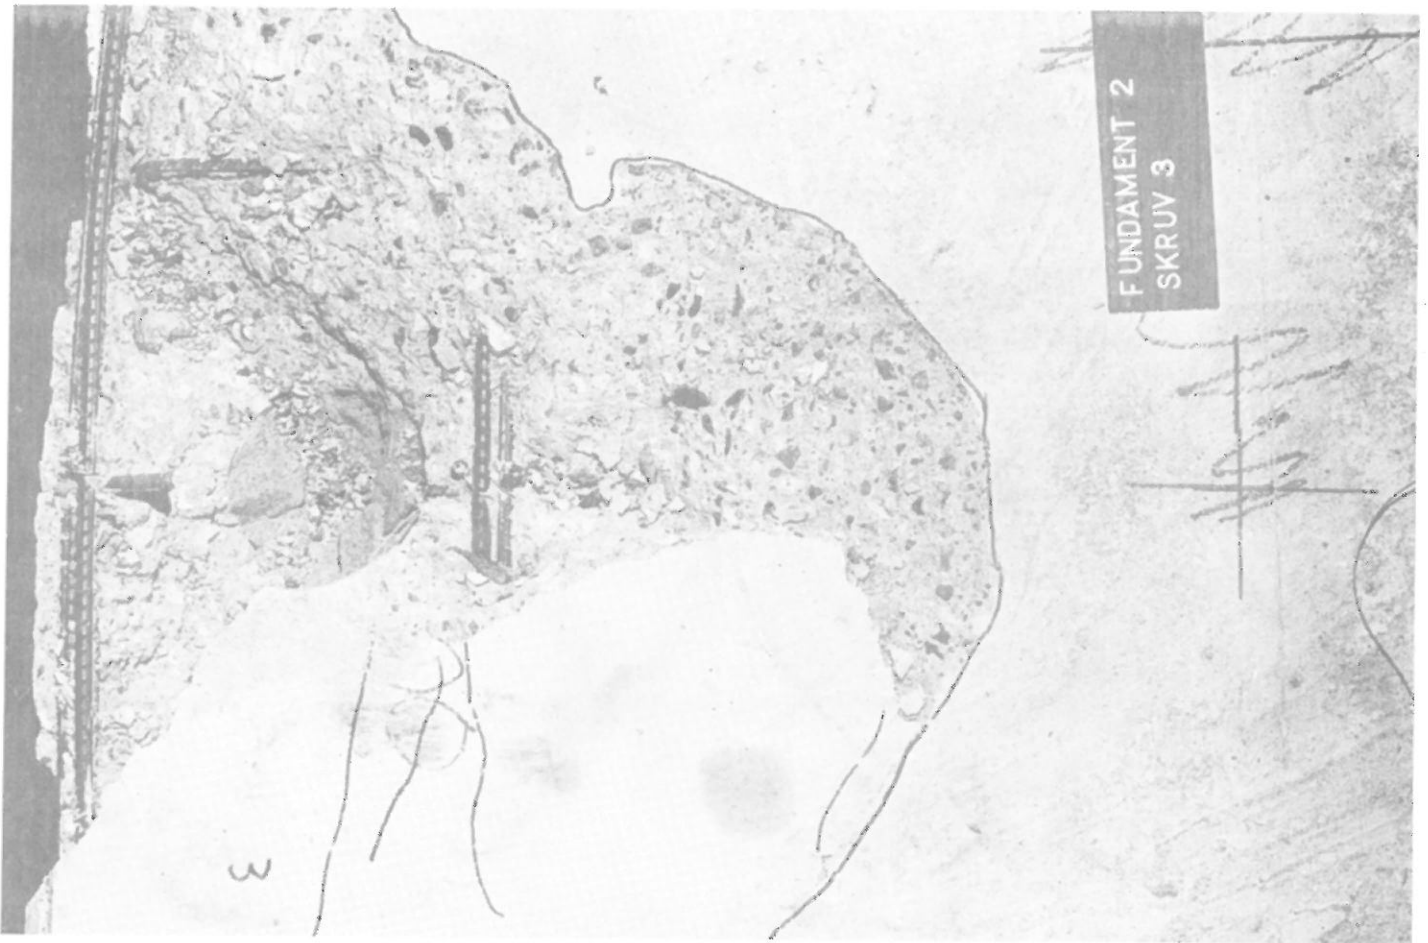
Anchor bolt SD 1:1 at failure (continued)
